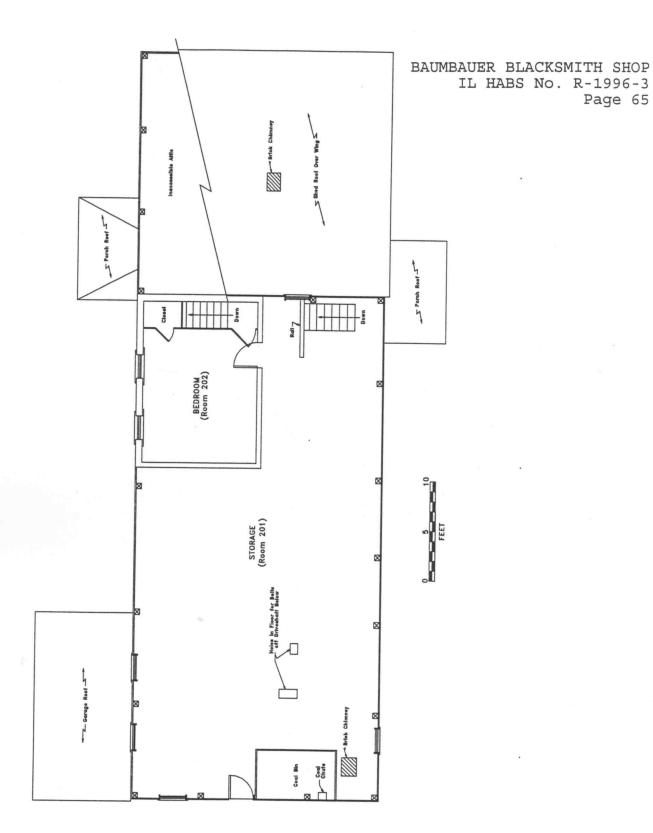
Second floor plan of the Baumbauer Blacksmith Shop, 1995.
